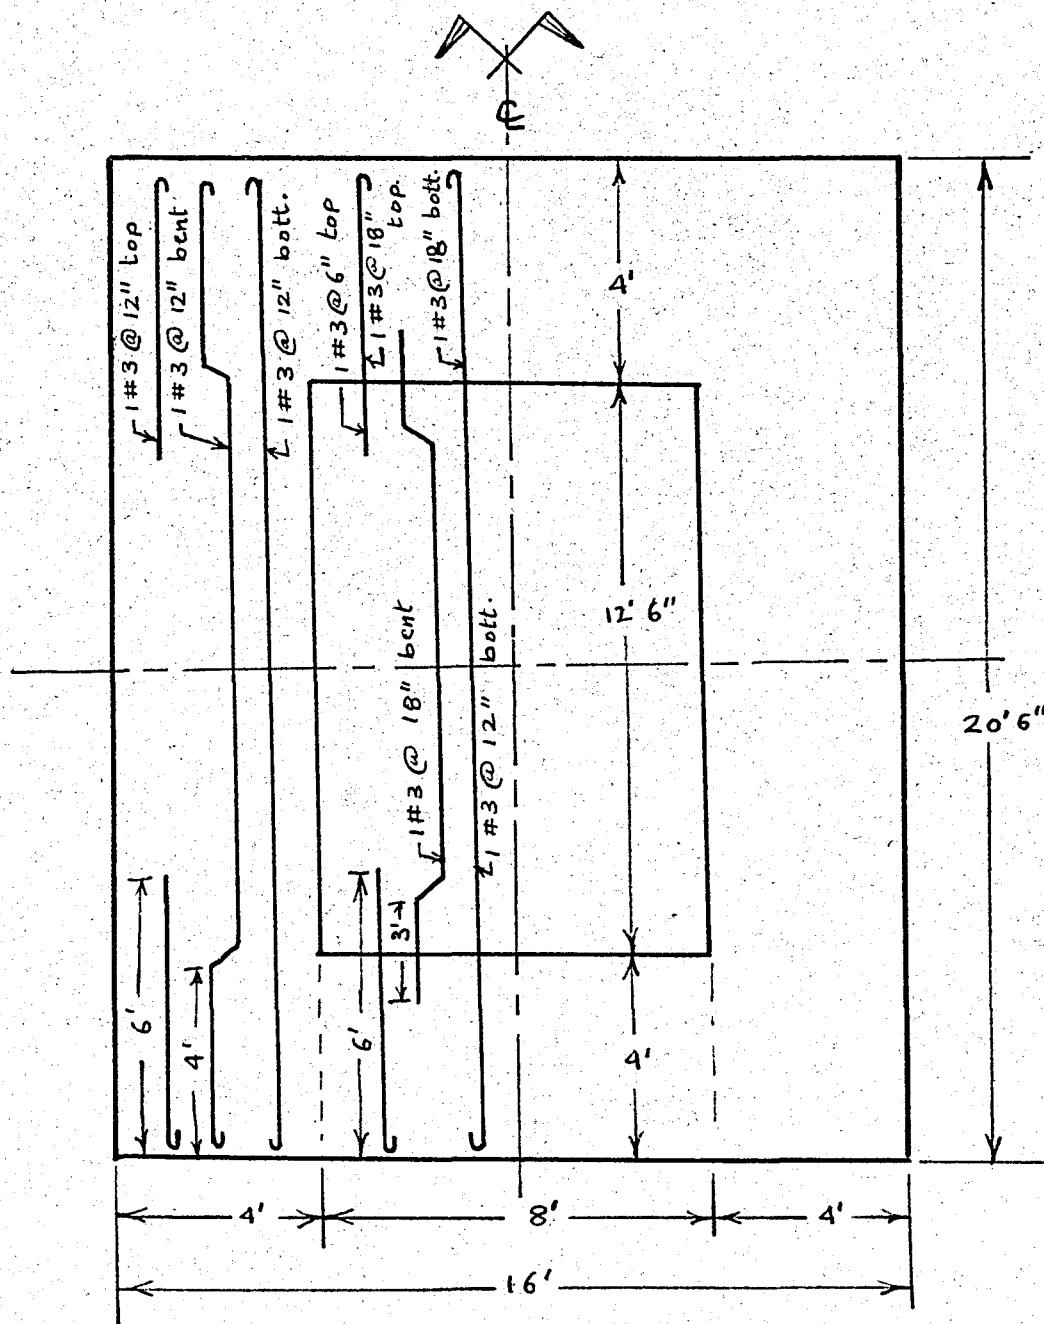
Top slab of Stairway - Steel Reinforcement.
